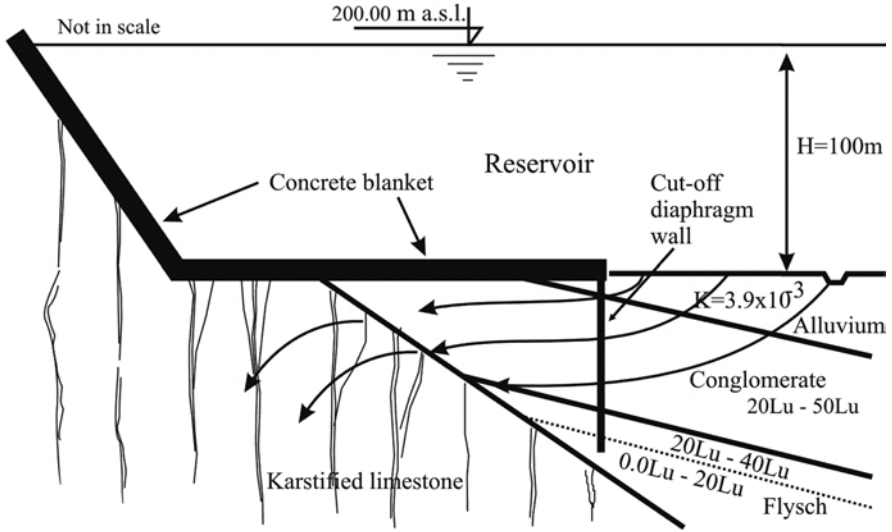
Akköprü reservoir, Turkey. Seepage protection – concrete slab and vertical cut-off diaphragm wall (Solution proposed by DSI, Ankara, Turkey)
